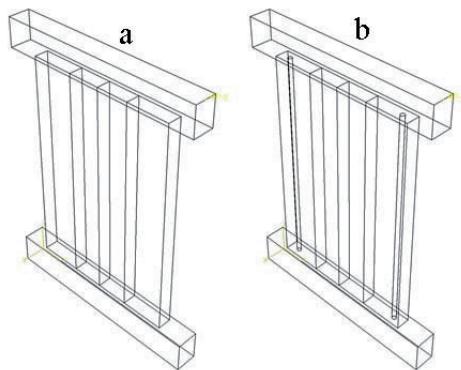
Assemblage layout for Shear Wall Specimen 15a Model-1(a) and Model-2(b).
